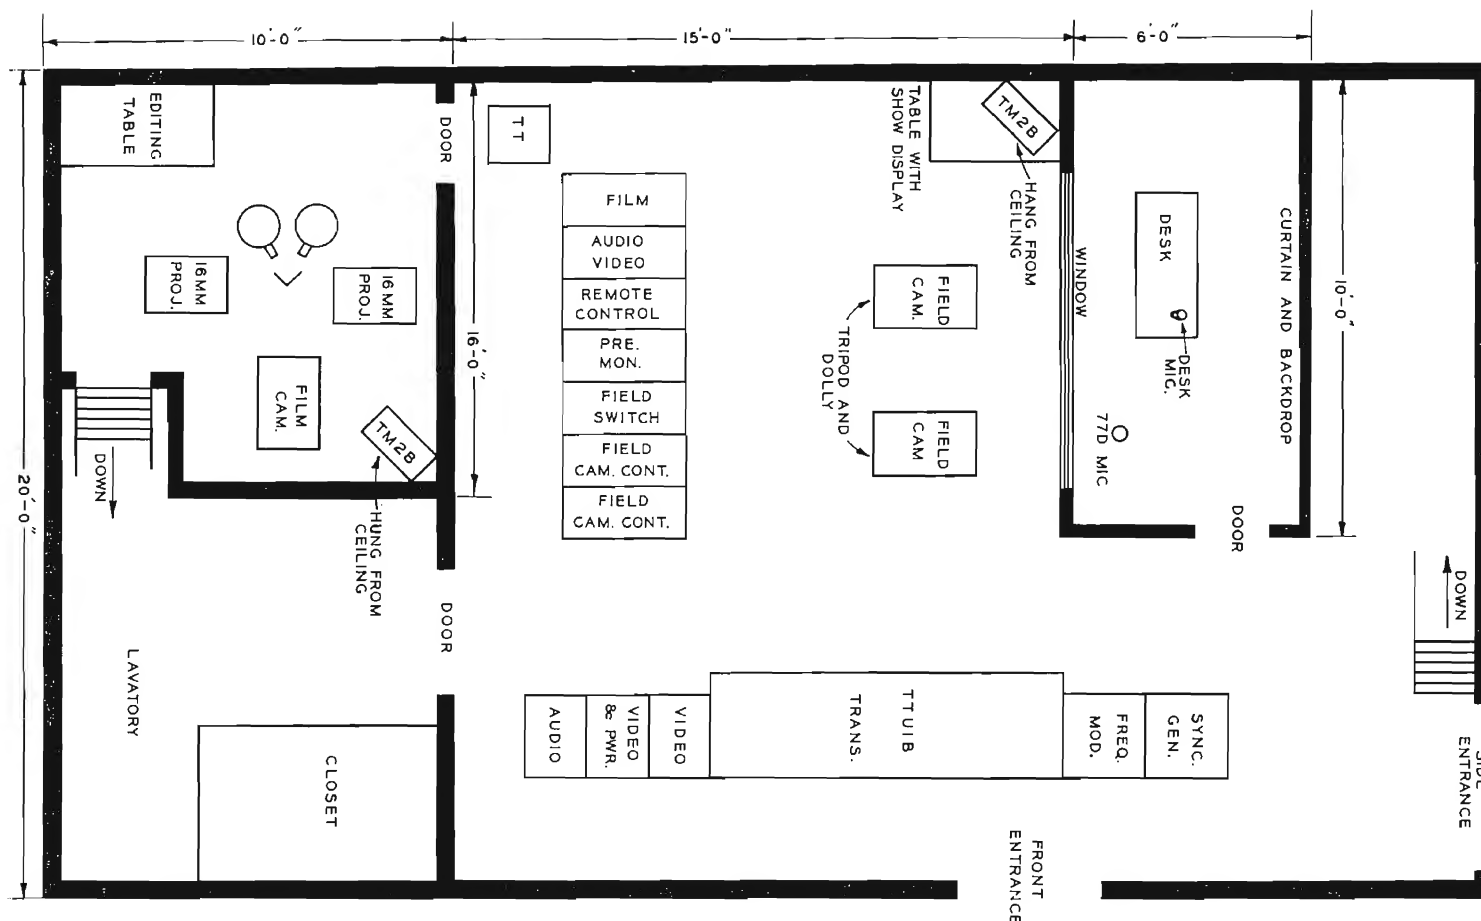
Floor plan showing transmitter layout of WSBA-TV facilities.
